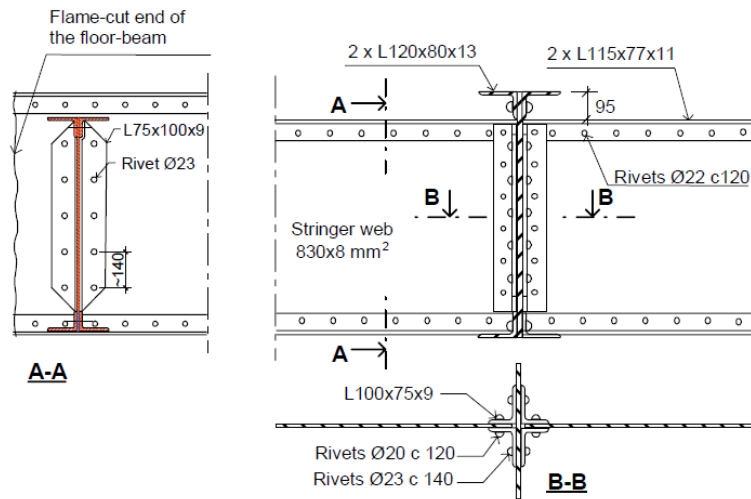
Stringer to floor connection, taken from the riveted railway bridge in Vin-delälven, Sweden
